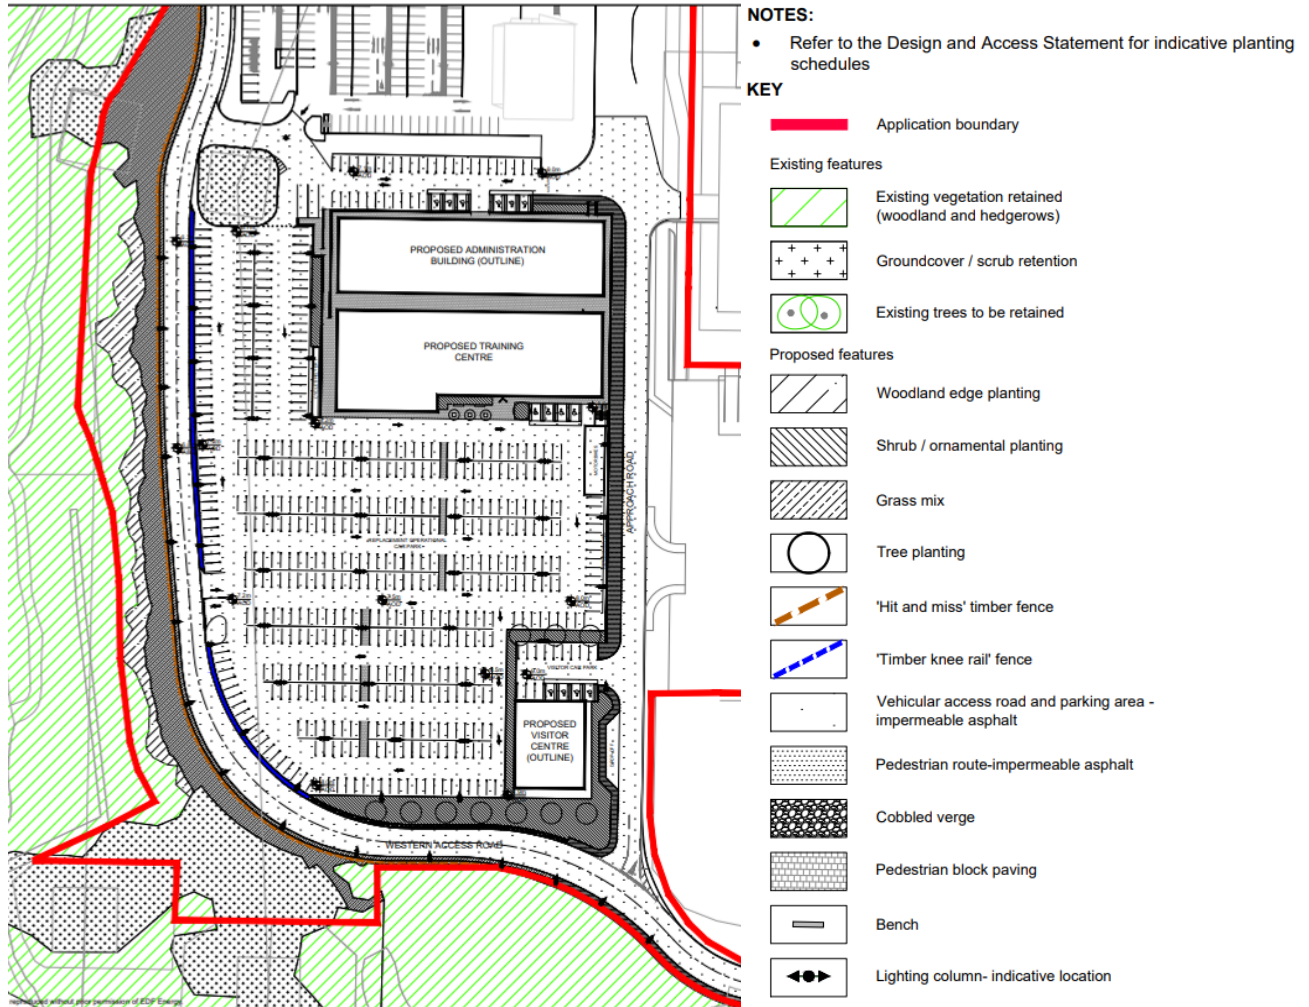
Scenario 1 Proposed Coronation Wood Development Area Landscape Plan
